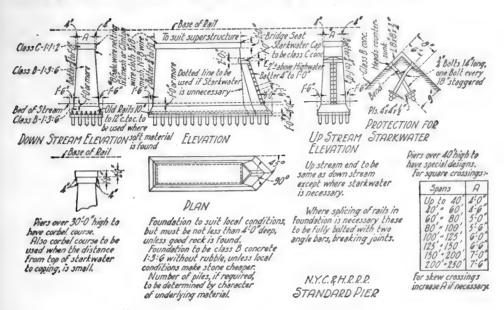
MASONRY PIERS, N. Y. C. & H. R. R. R.
